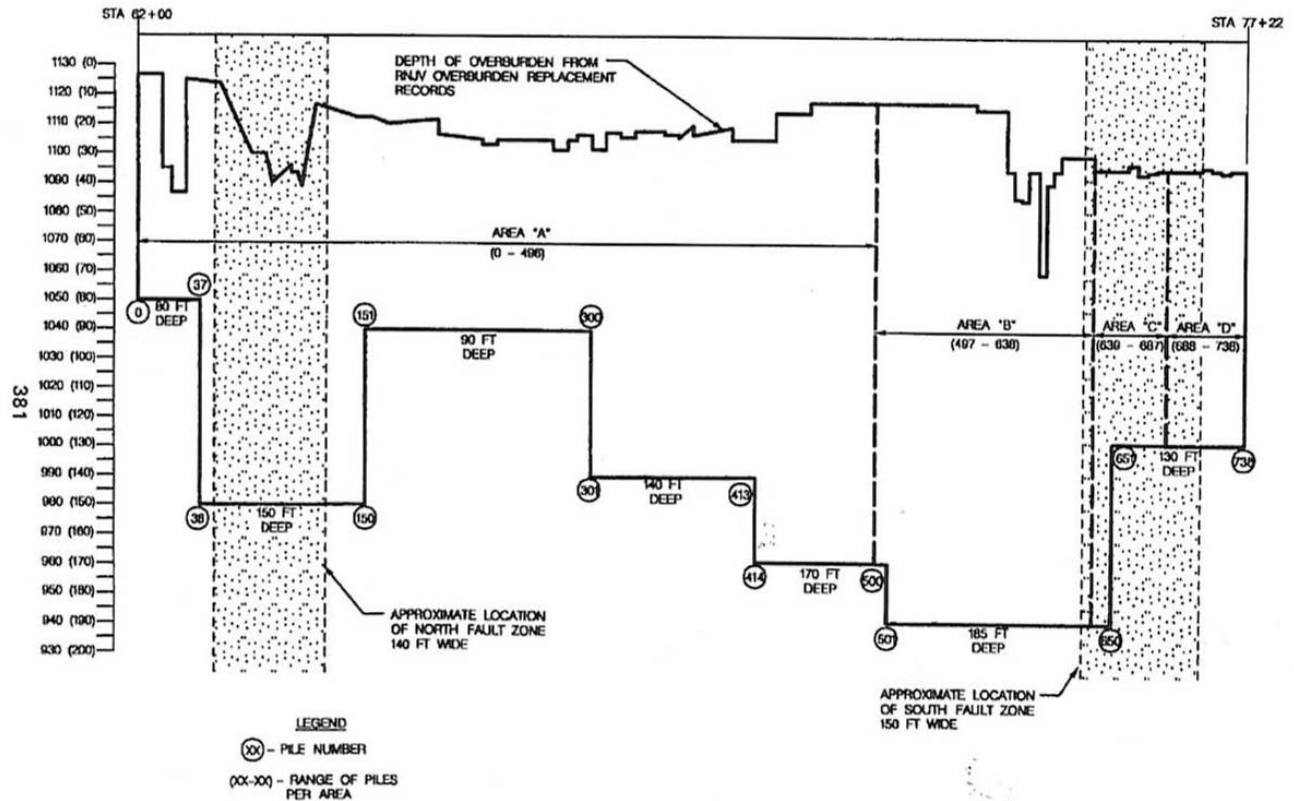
Elevation of the cut-off wall showing main construction parameters. Beaver Dam, AR. (Bruce and Dugnani, 1996).
